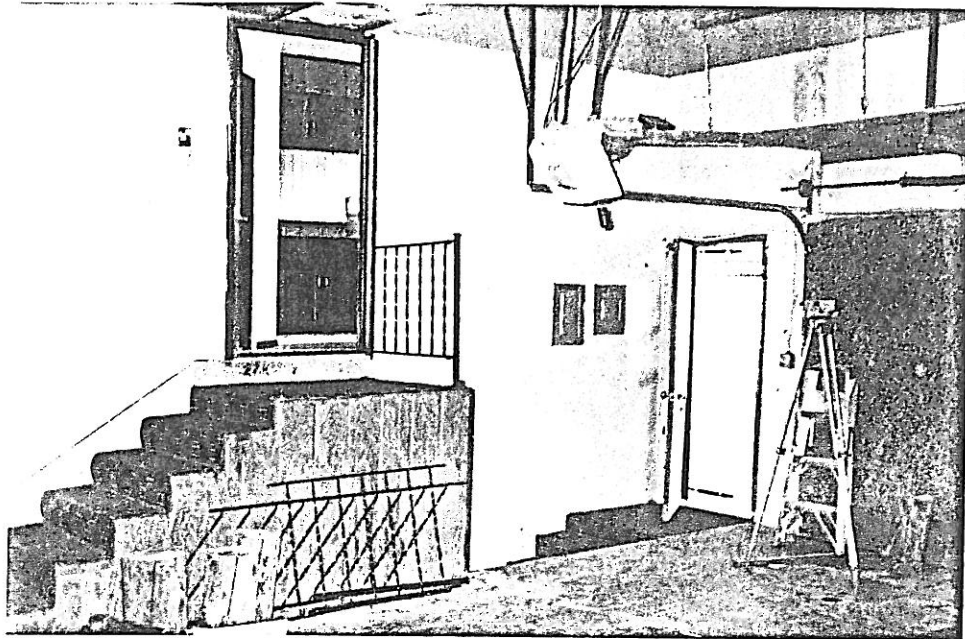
GARAGE AREA; ENTRY DOOR IS AT RIGHT WITH STAIRWAY TO BASEMENT, DOORWAY TO FIRST FLOOR IS AT UPPER LEFT.
